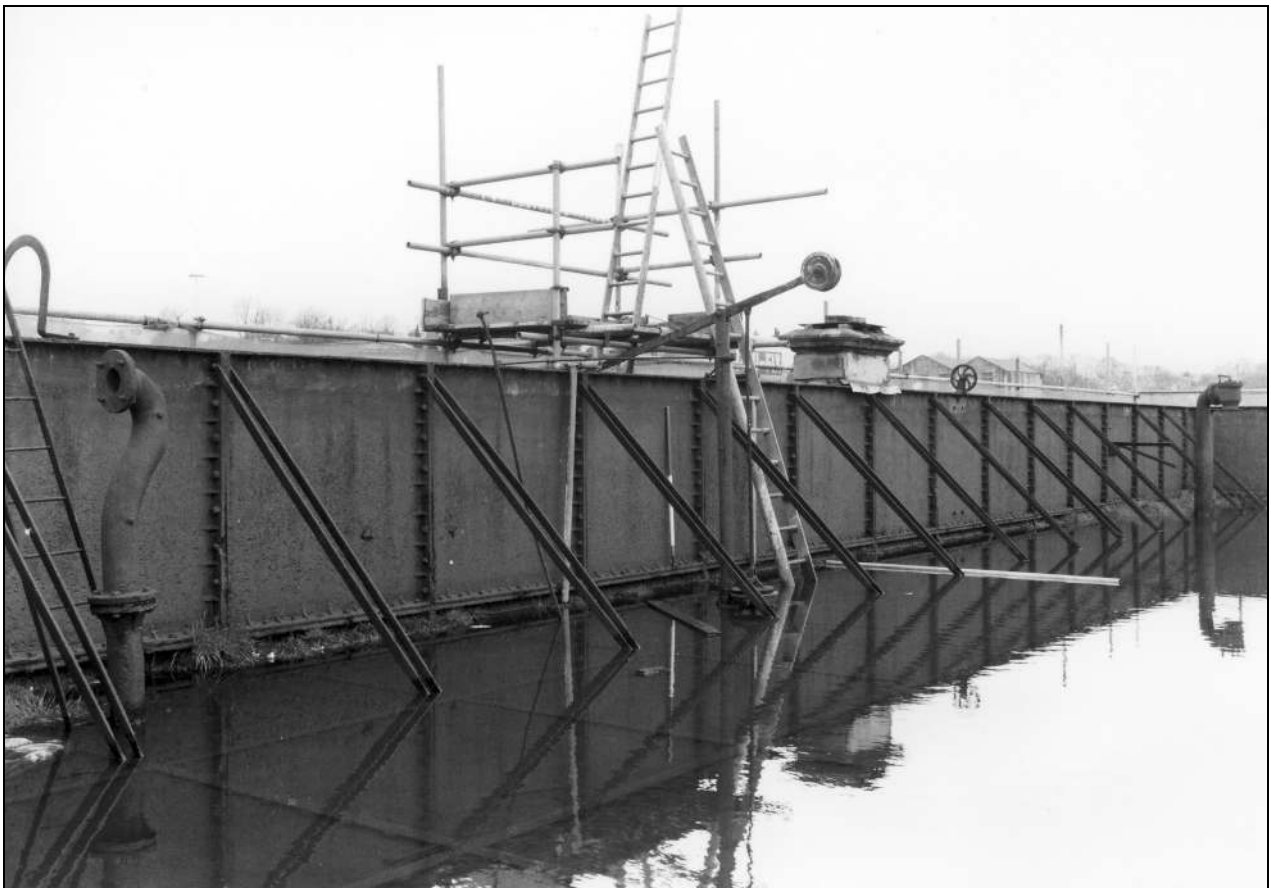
General view of south-west corner of tank (film 7, frame 16)
